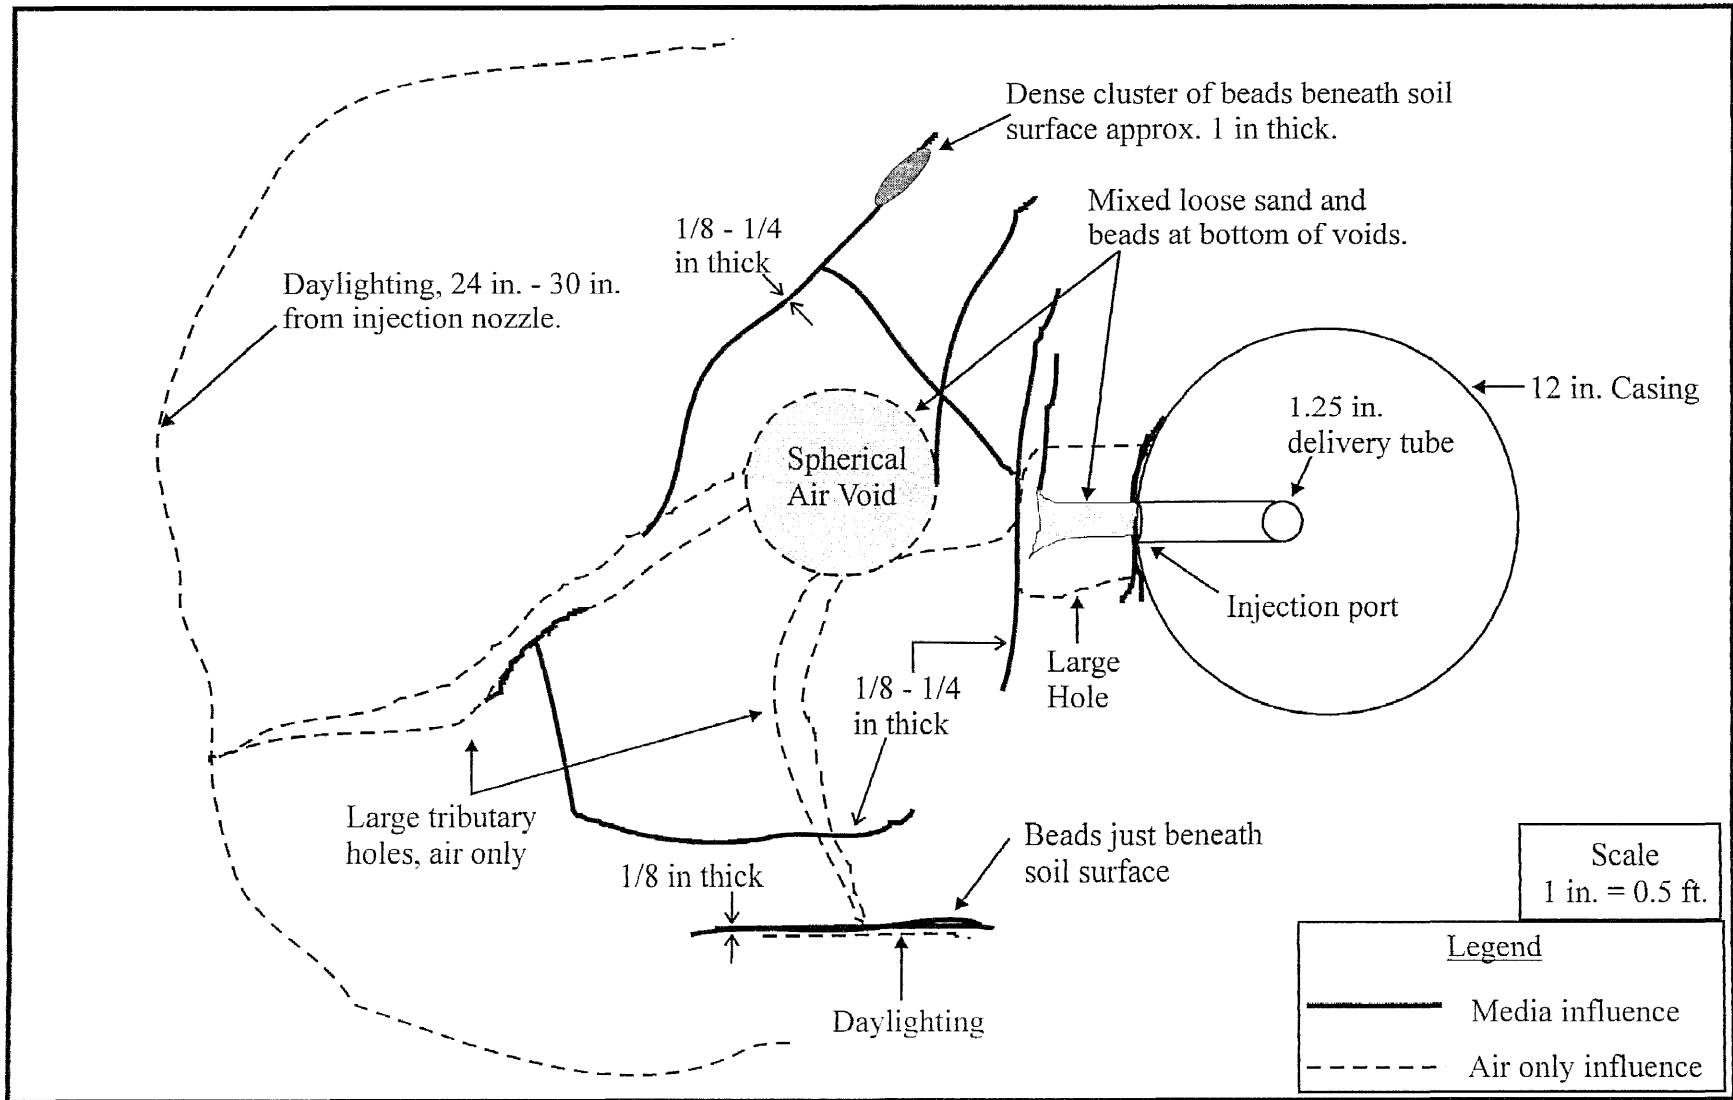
Engineering Scale Excavation, Injection #2. Plan View
